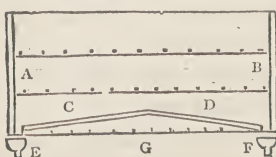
ARRANGEMENT FOR THROWING WATER TO CORNERS OF ROOF.
